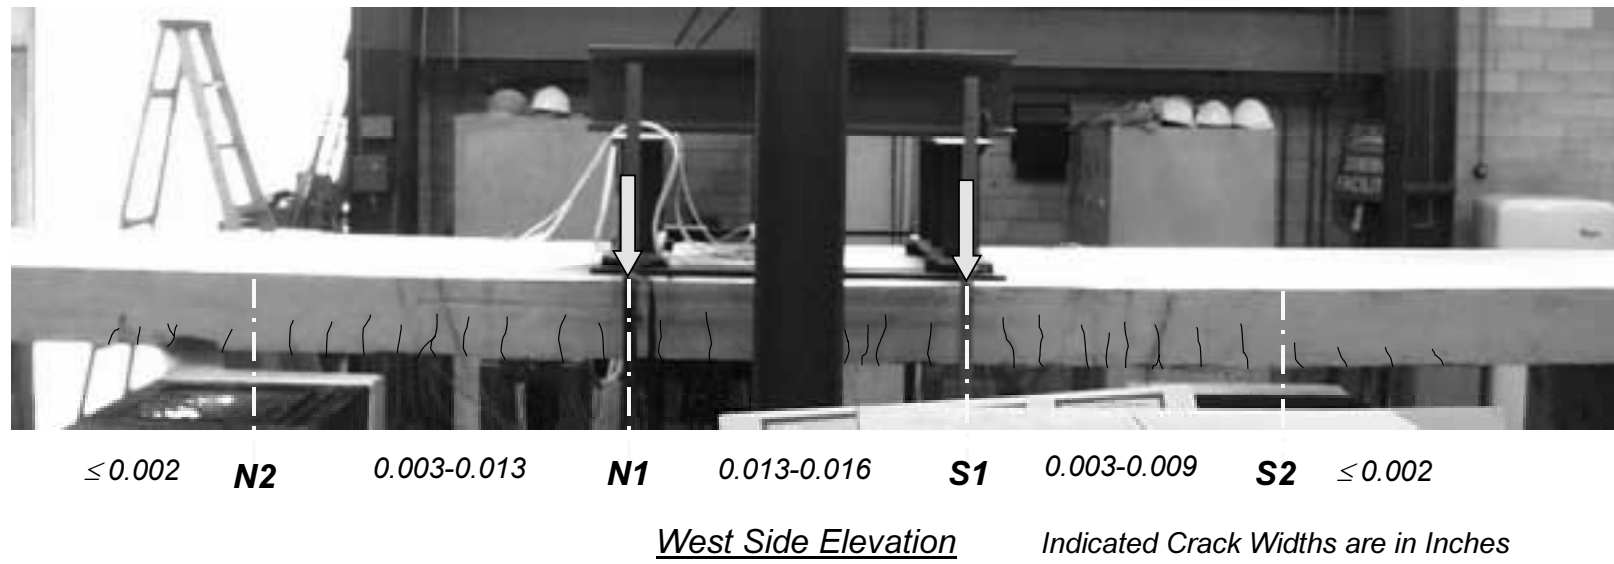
Crack Pattern for Specimen FS-1 at Load Stage 2 (34 kip)
